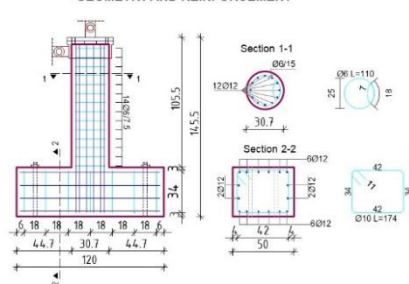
Geometry and reinforcement of the tested shear failure circular RC bridge pier prototype. Models M2-A and M2-B.
